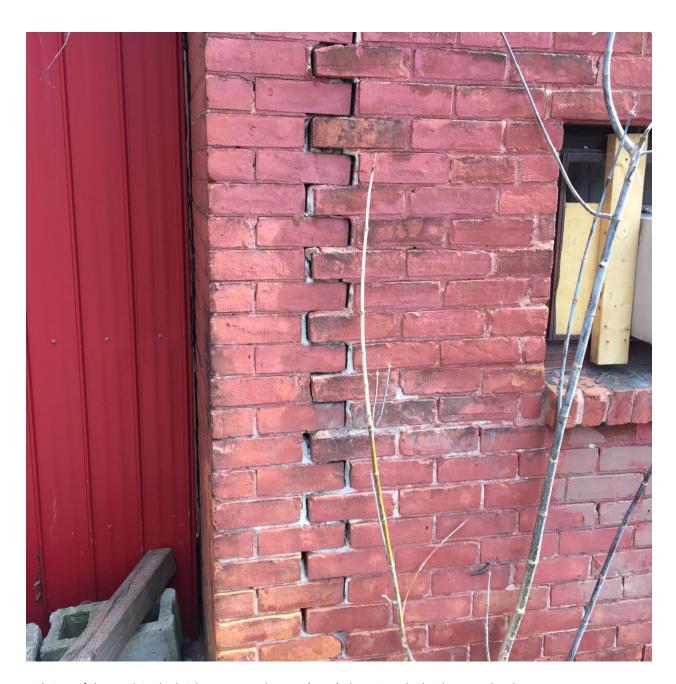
Detail view of the crack in the brick veneer on the rear (west) elevation. The brick veneer has been displaced outward possibly due to the rusting of the metal ties that secured it to the board sheathing. Credit: Neil Zaret 2016.
